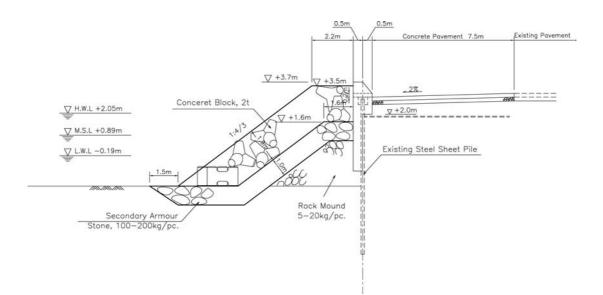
Typical Cross Section of the Fishery Jetty Revetment
